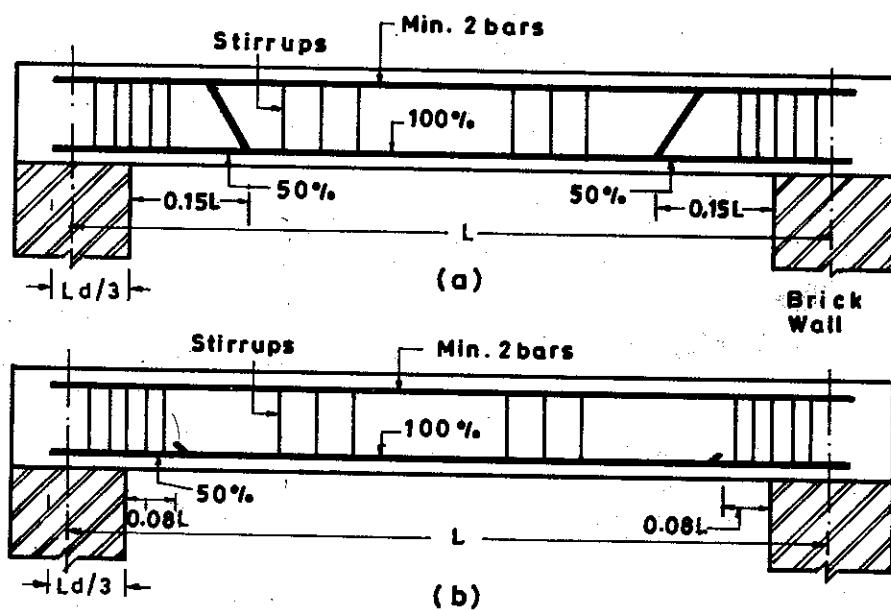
Reinforcements for simply supported beams with UDL: (a) Using bent-up bars; (b) Using straight bars.
